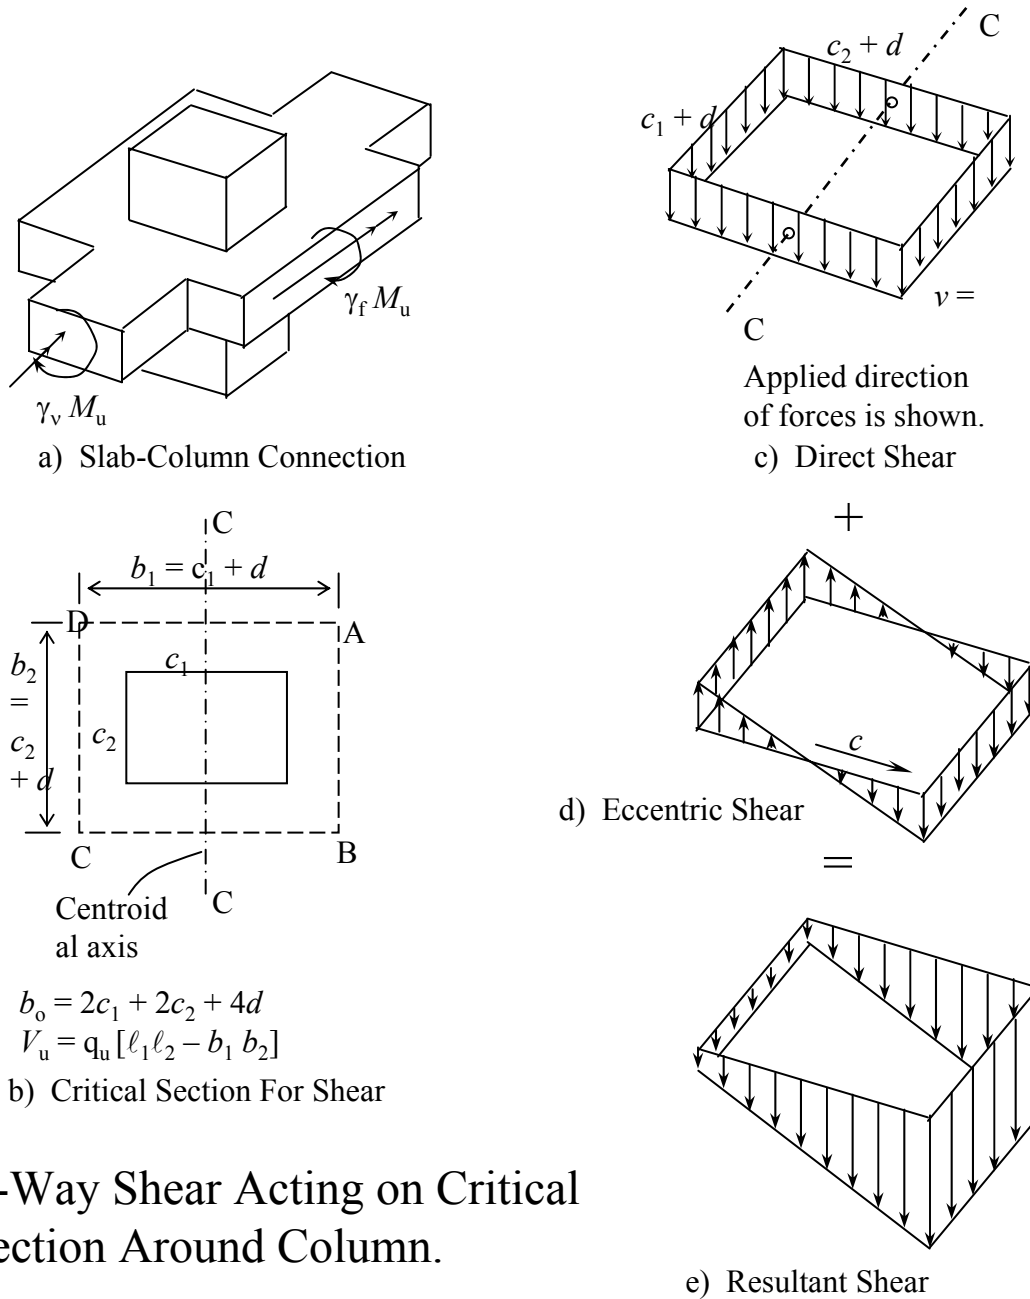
Two-Way Shear Acting on Critical Slab Section Around Column.
